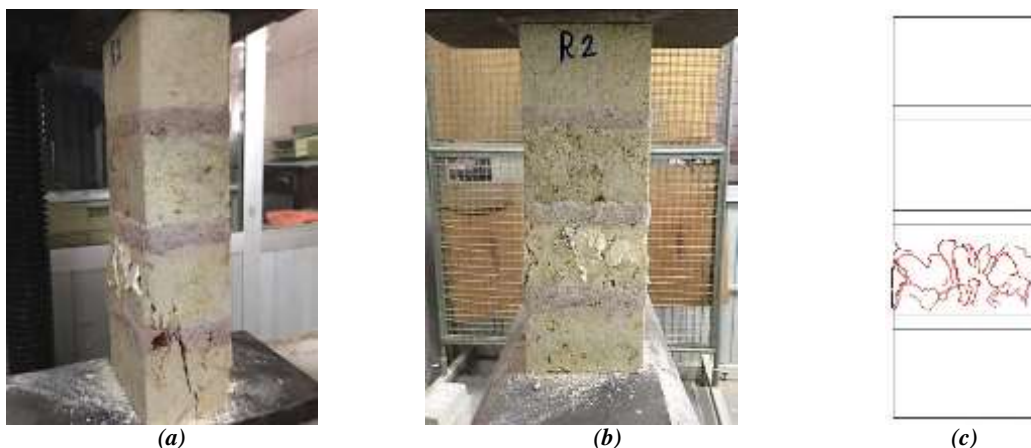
shows the typical failure mode of the strengthened masonry prisms with bed joints reinforcement, (a): during failure, (b): failure mode, (c): a sketch for failure pattern (crushing).
